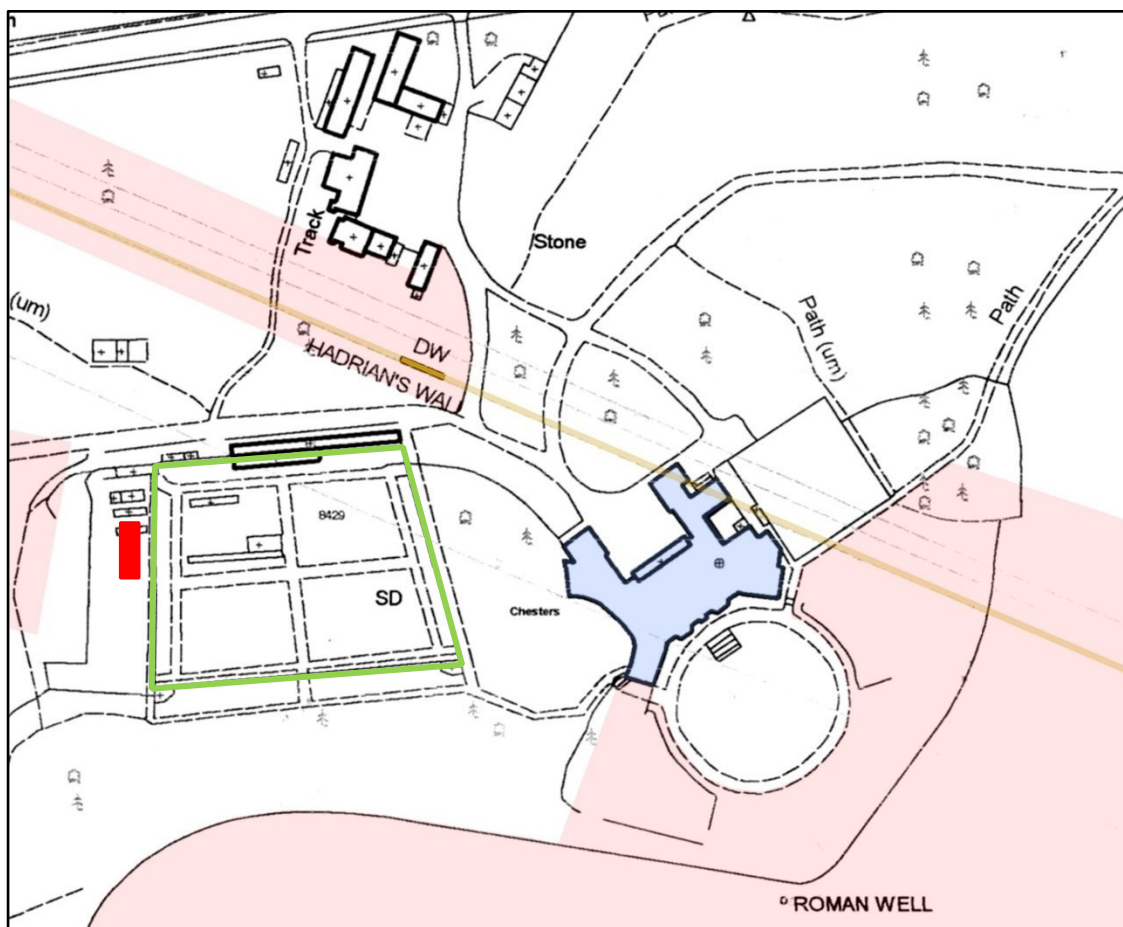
Chesters House (blue tone) and walled garden to west (green outline). Scheduled areas are in pink tone. The approximate location of the new storage shed is shown in red. Hadrian's Wall lies to the north. Not to scale, north to top.
